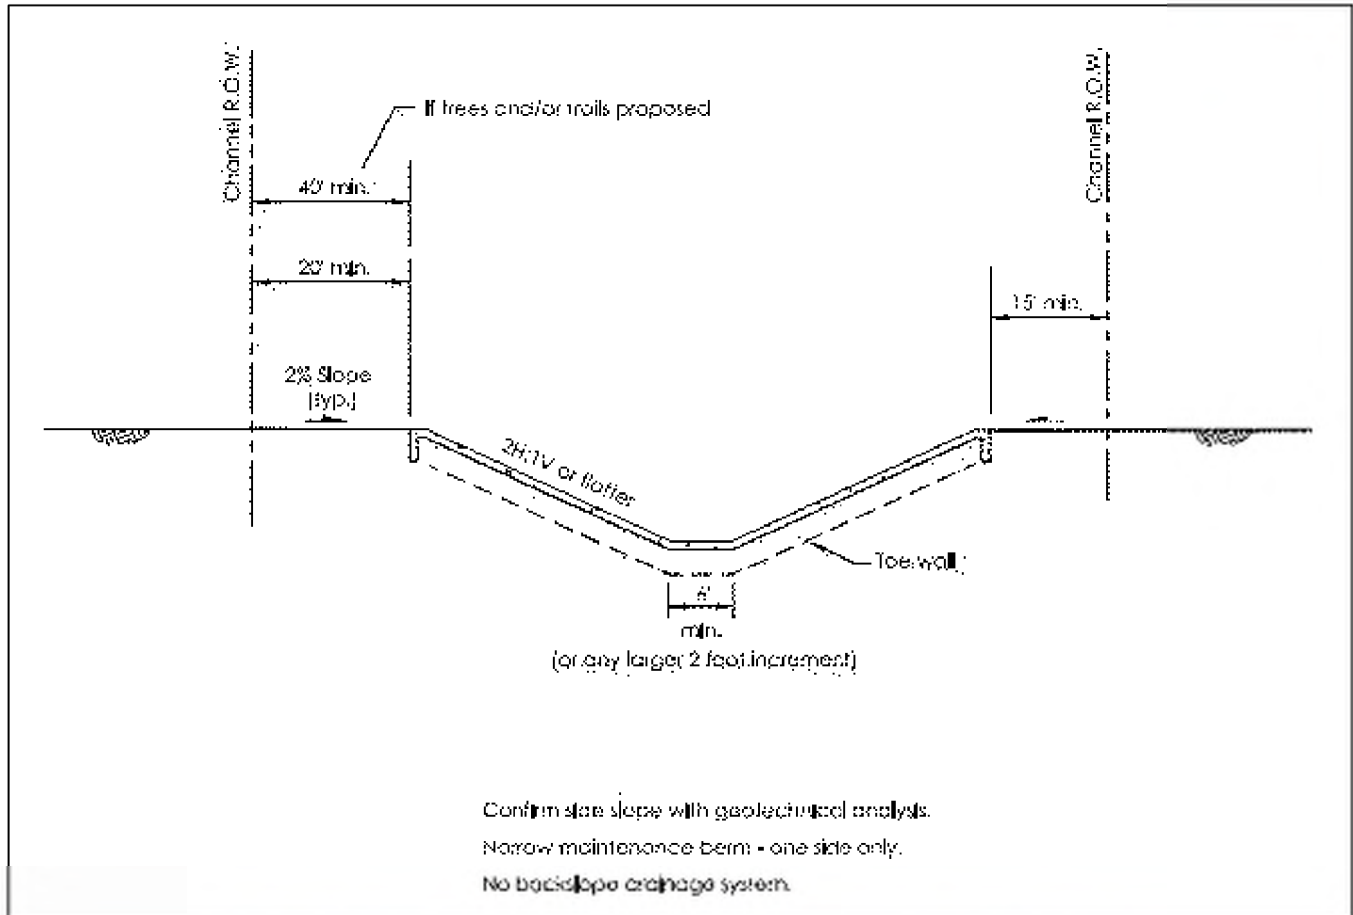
HCFCD Concrete-lined Trapezoidal Channel Design (HCFCD, 2019)
